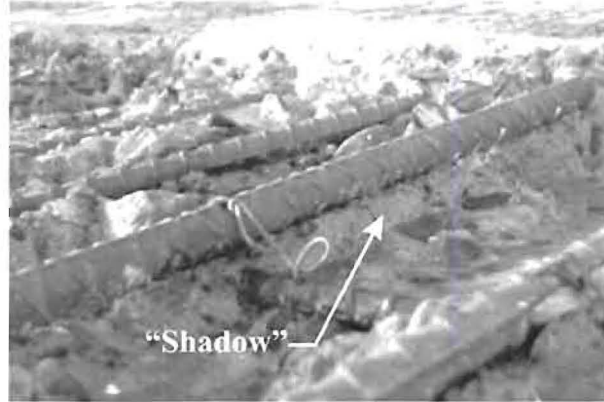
"Shadow" under the rebar (note tie wire undamaged and in excellent condition)
